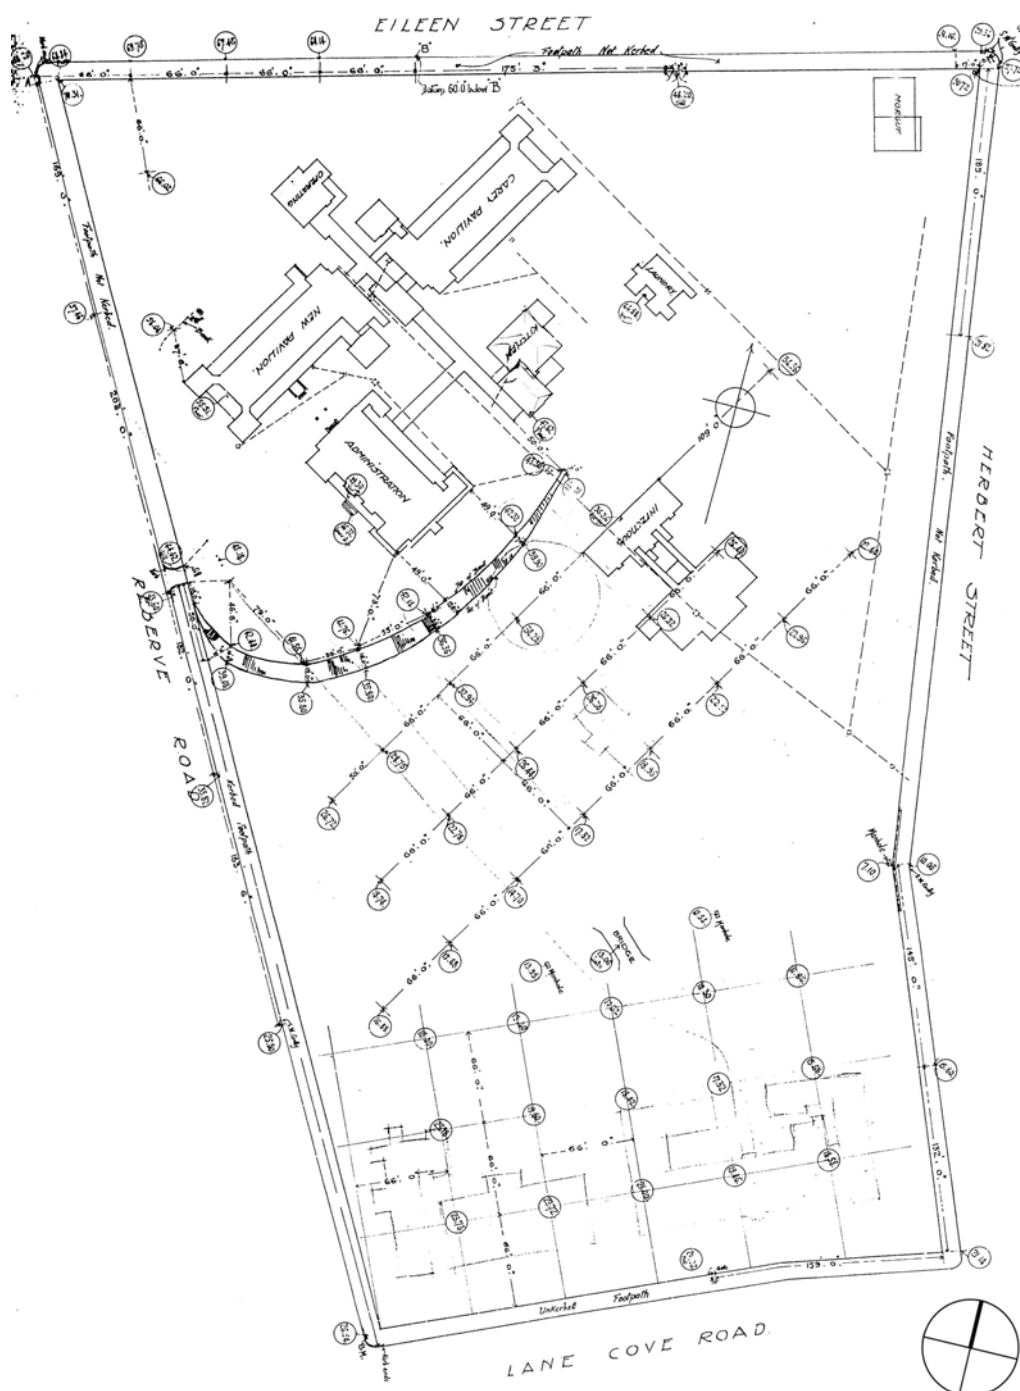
Plan showing the Hospital site and Shervey's design c1914 with later additions. (Source: PH163/15, Department of Commerce)
